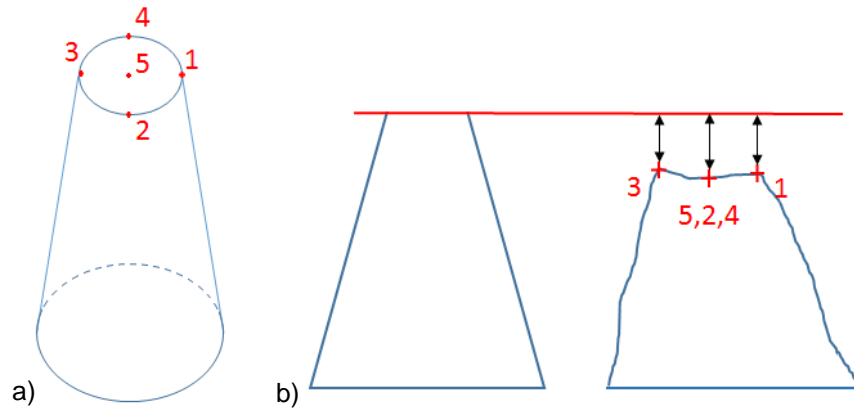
a) Perspective view of the mold b) Slump test and measurement
